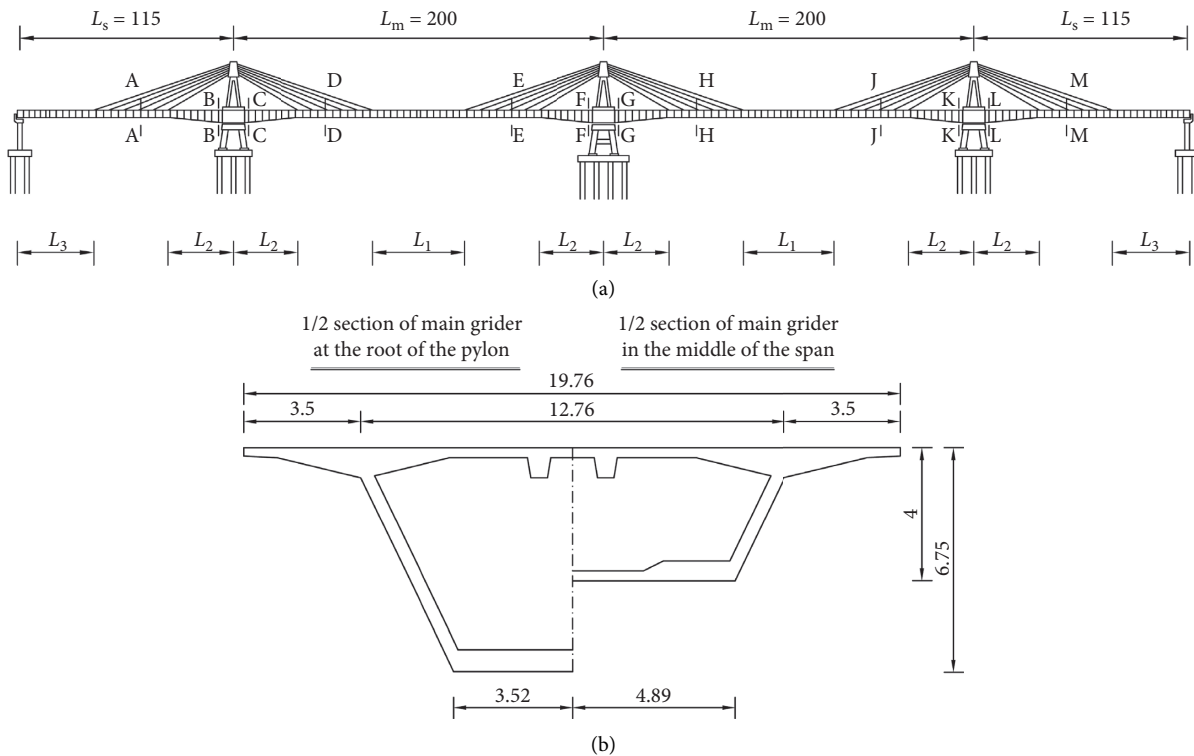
The layout and standard cross section of the main bridge of Paira Bridge in Bangladesh. (a) Layout of the bridge type (unit: m). (b) Standard cross-sectional arrangement (unit: m).
